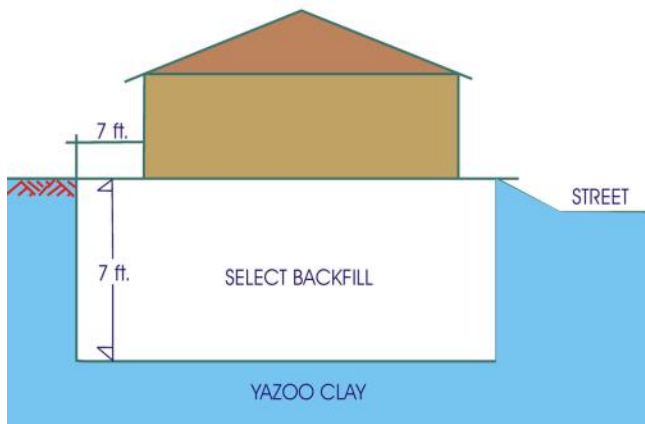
Foundation where a 7-foot-thick section of Yazoo clay has been excavated and replaced with 7 feet of compacted select backfill. The excavation and backfill extend 7 feet laterally from the edge of the slab foundation. Specifications for the fill in this foundation require a low plasticity clay with a liquid limit no greater than 45% to prevent the fill from becoming water saturated. Image 1945, modified from Tommy Dunlap's slide presentation.
